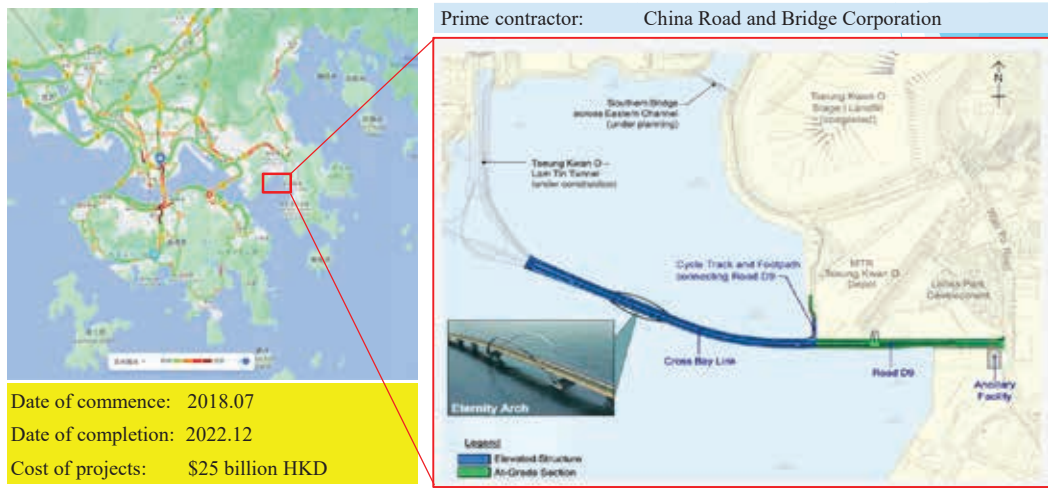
Double Arch Steel Bridge of Cross Bay Link in Tseung Kwan O, HK
